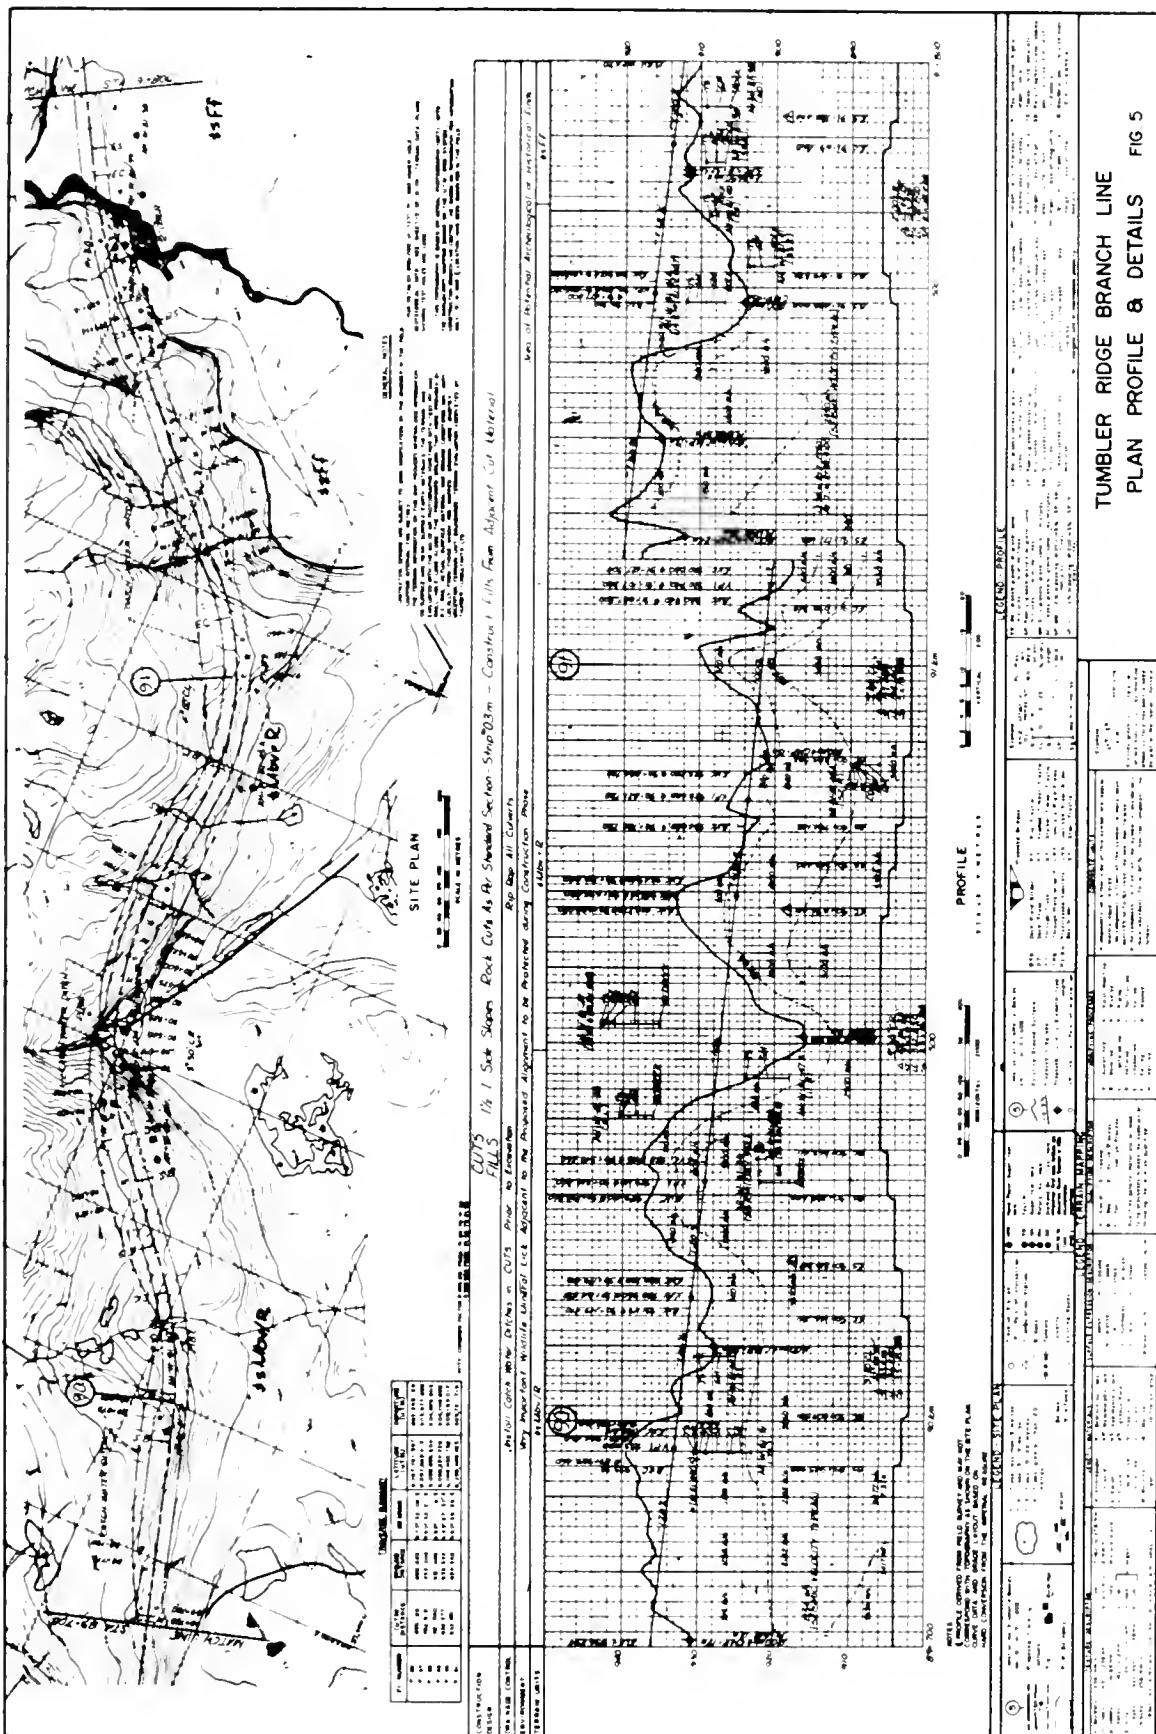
Tumbler Ridge Branch Line—Plan Profile & Details
